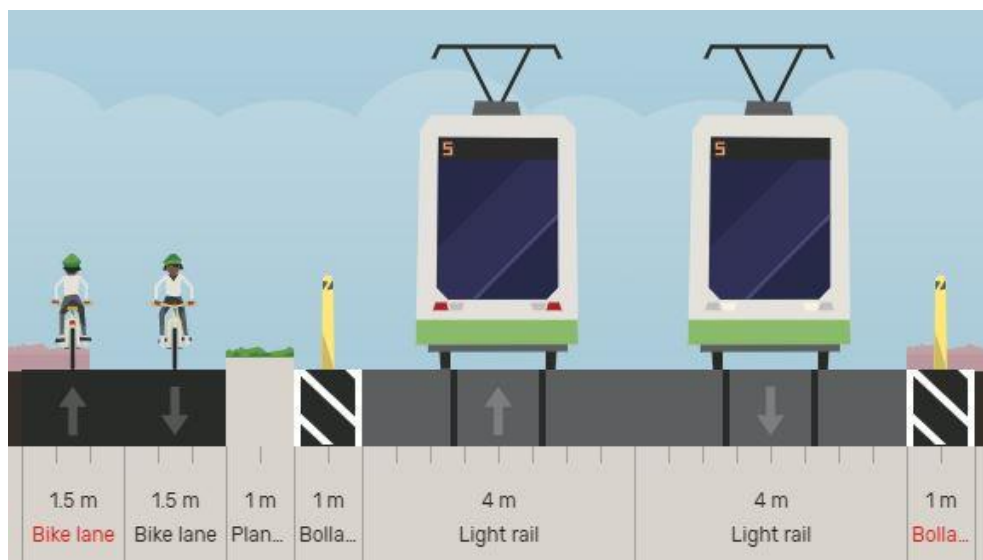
Indicative cross section light rail (14m dual carriageway)
